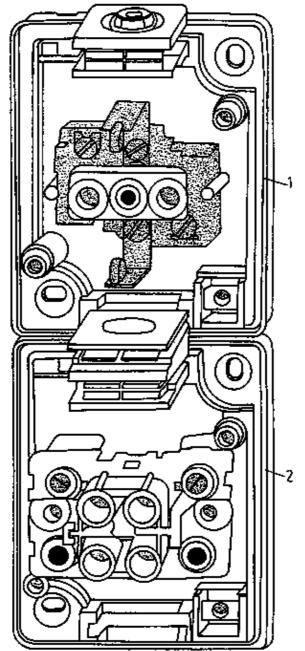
Moisture–proof switch and moisture–proof socket–outlet with earthing contact, open (surface design IP 41)
